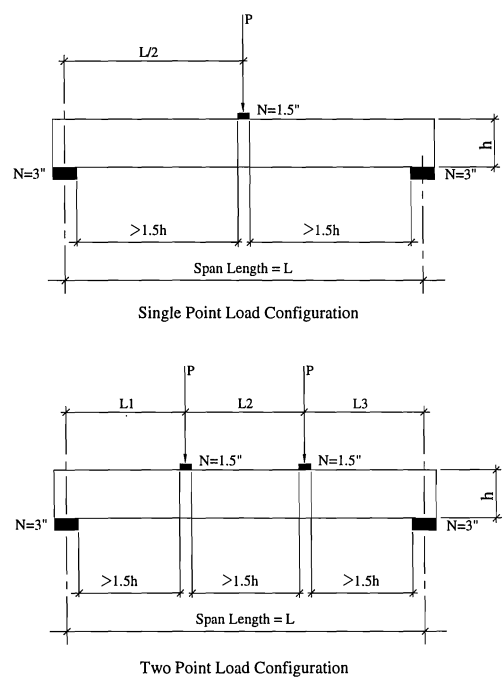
Typical Test Specimen Loading Configurations (1-inch = 25.4 mm)
